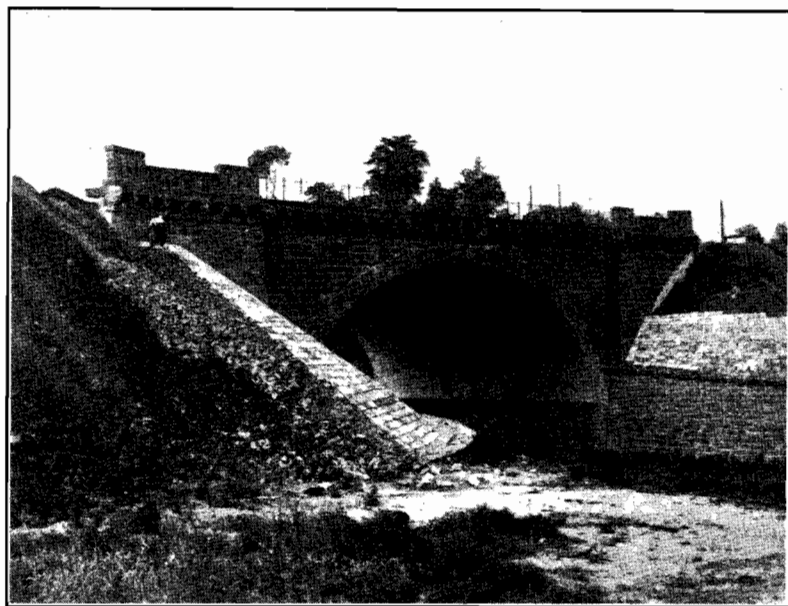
Merri Creek bridge under reconstruction on Main Heidelberg Road.
